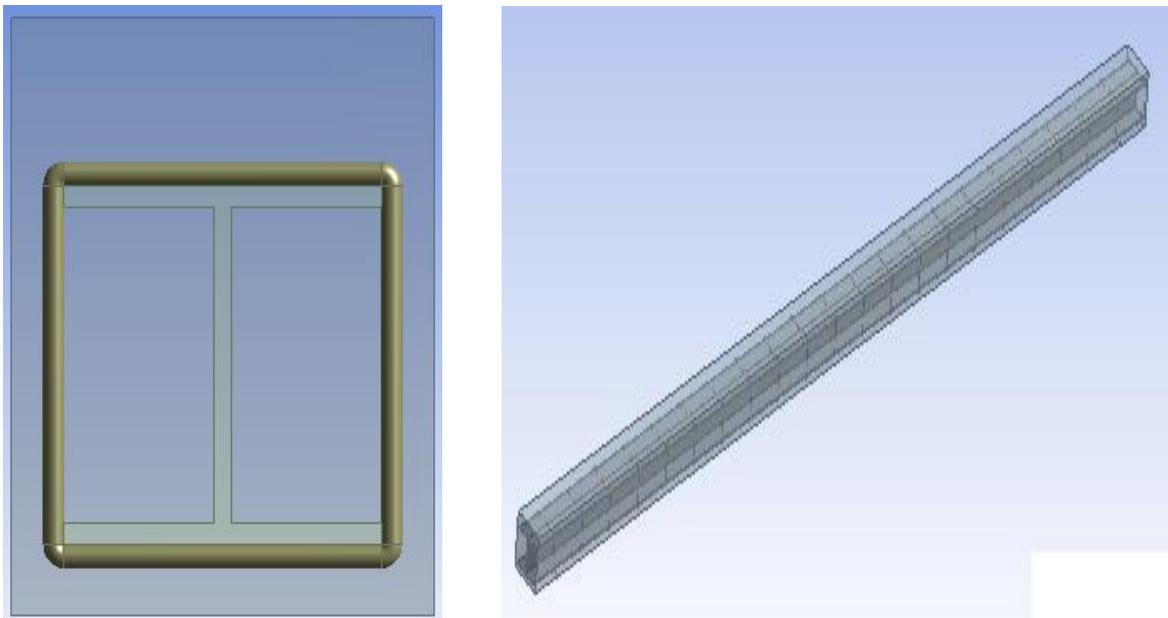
Geometry and modelling of precast encased composite beams with I section
